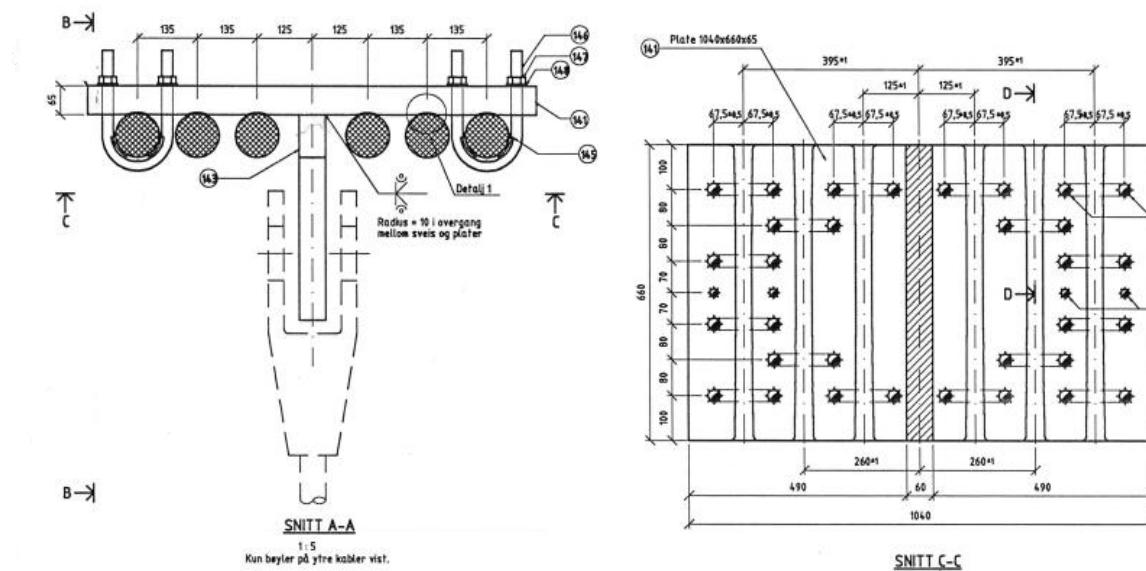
Connection details between the hanger and the main cable of the Lysefjord bridge
